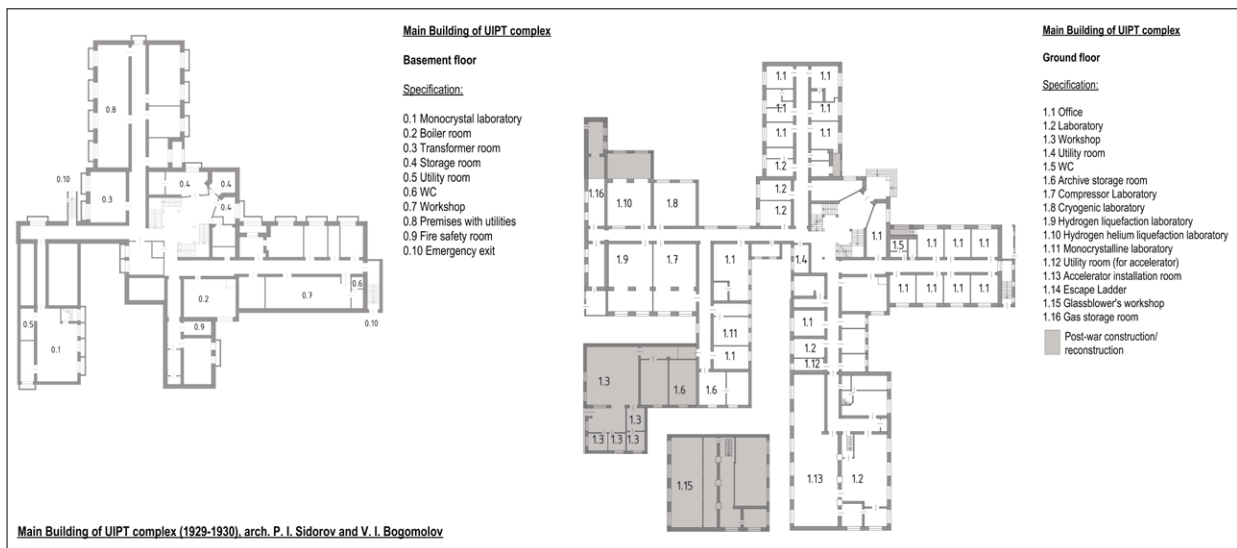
Main Building, basement and first floor plans; by K. Didenko and O. Bondarchuk based on archival NSC KhIPT documents
